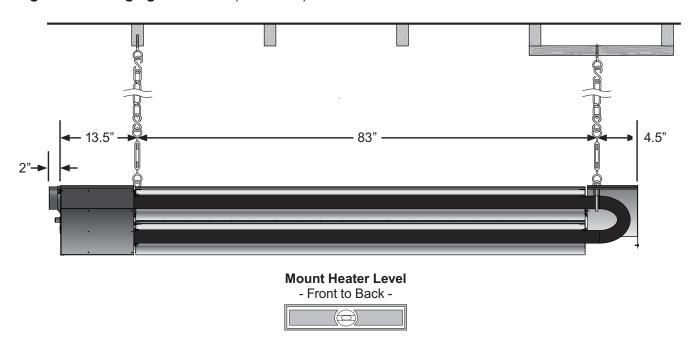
• Hanging the Heater (Burner Box Back View)
